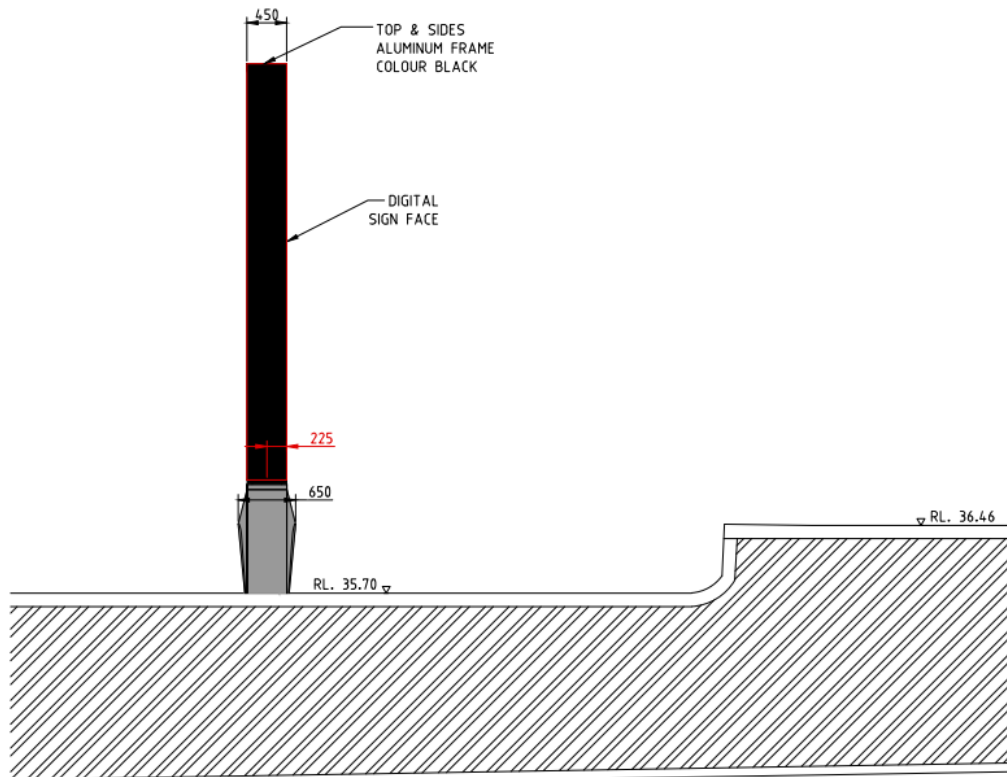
Elevation of proposed sign (Source: Dennis Blunt Consulting Engineers)
